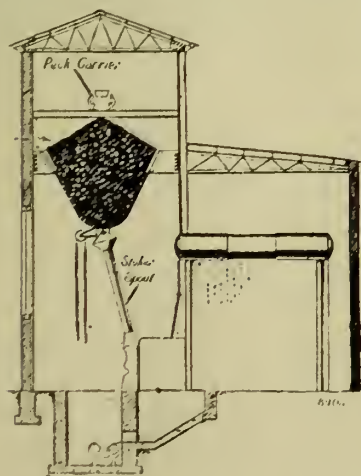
Boiler Room with High Roof over Bin and Low Roof at Rear.
